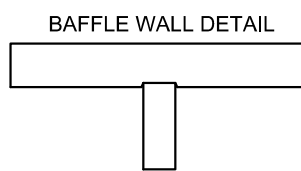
DETAIL PROVIDED BY SHEA CONCRETE PRODUCTS
